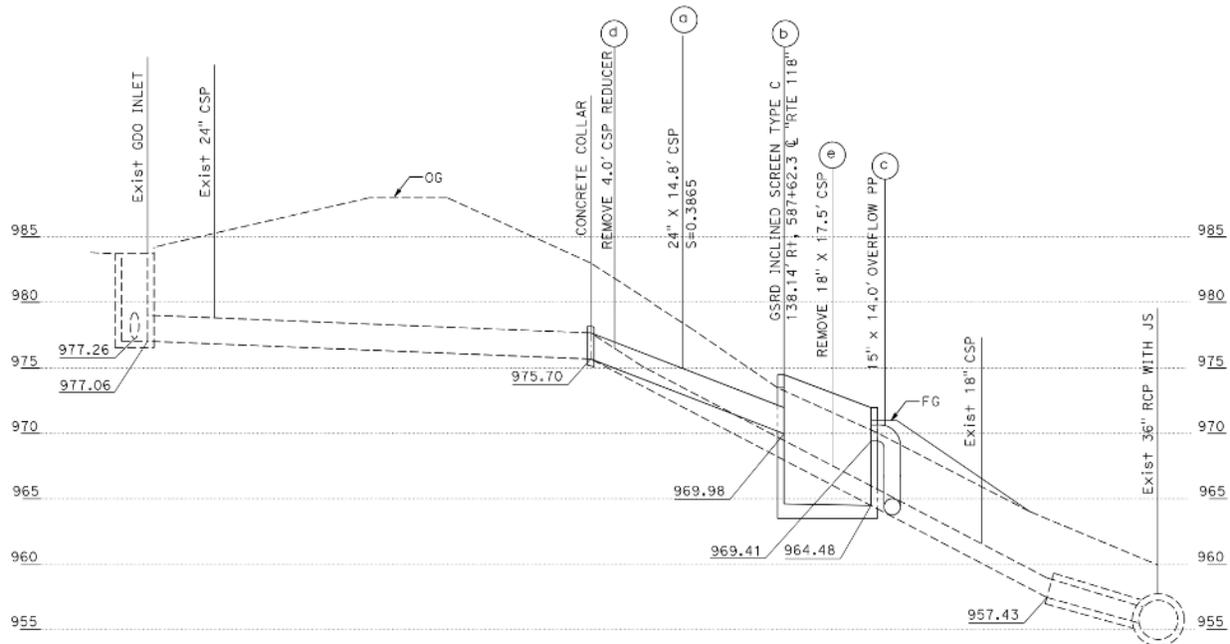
Drainage Profile and Proposed GSRD – Highway 118 Outfall at Chamberlain Street and Arleta Avenue
